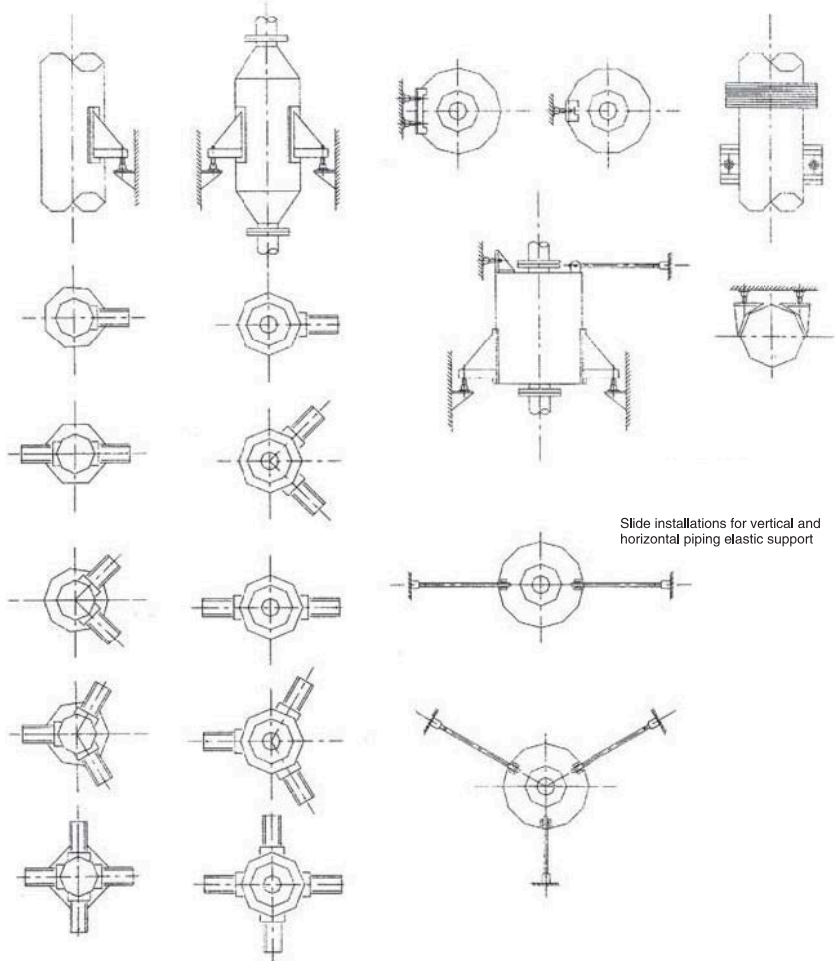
All kinds of layout forms for piping system erection equipment elastic supporting
